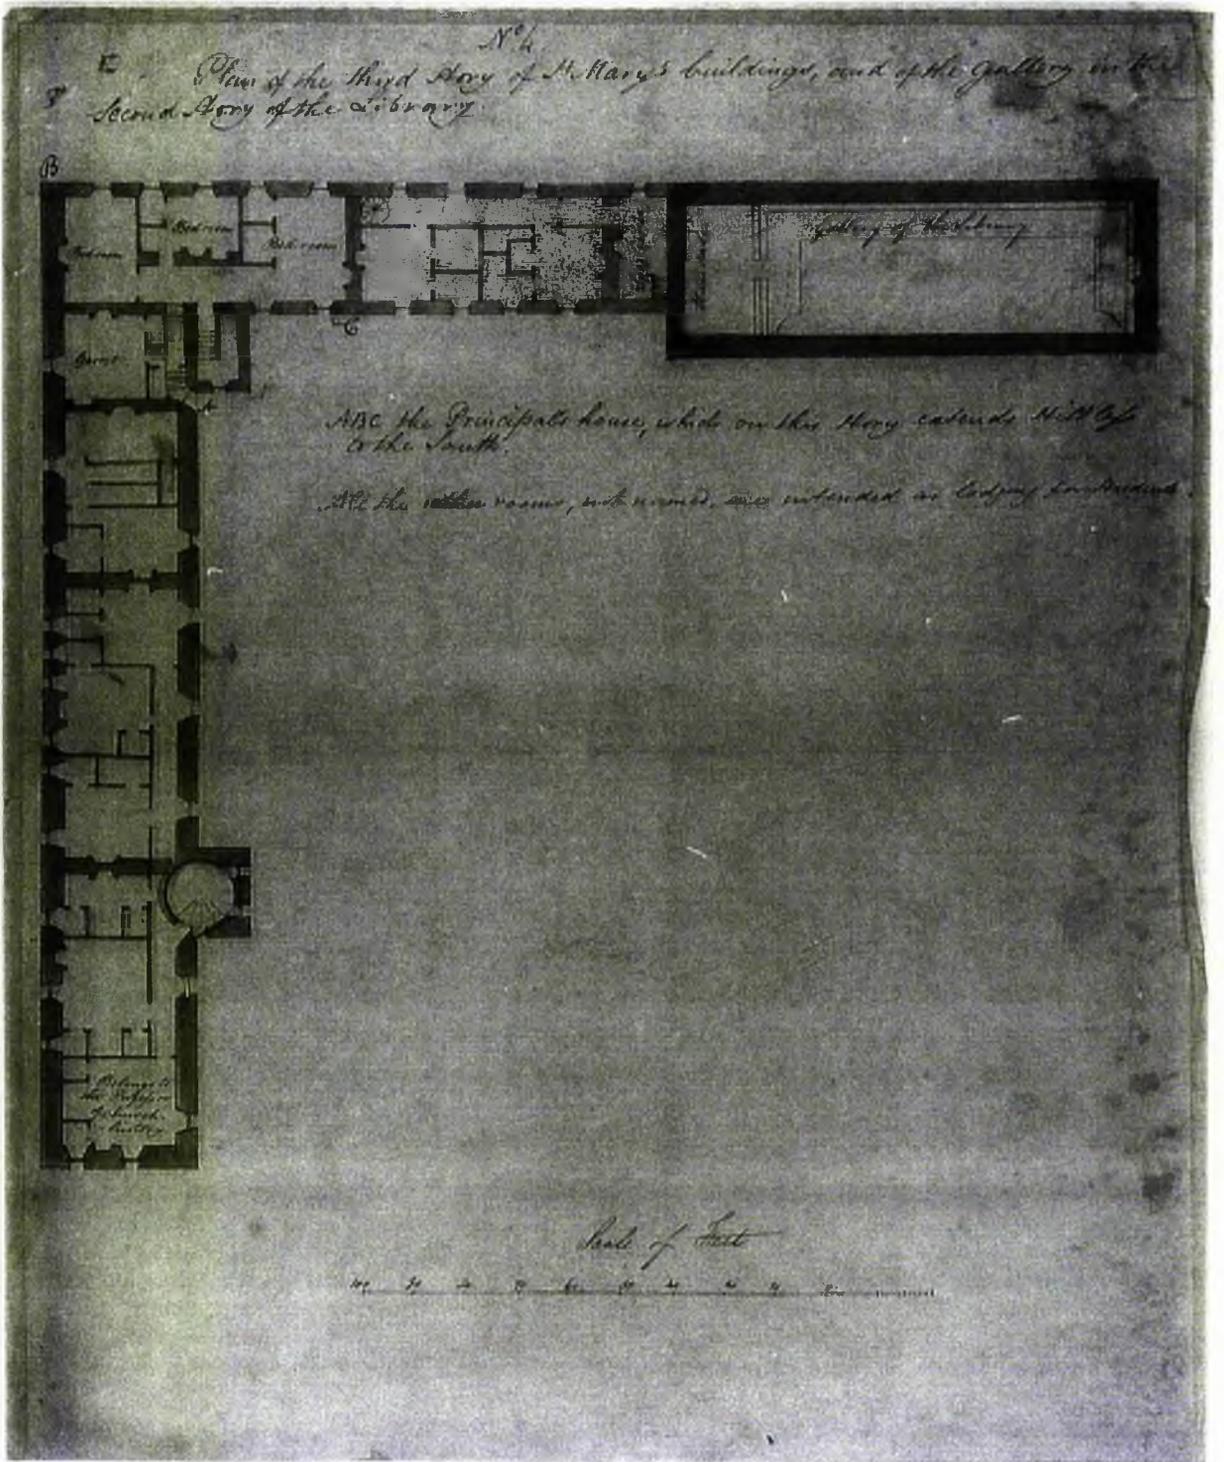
St.Mary's College. Second floor plan survey drawing No.4. R. Reid, probably drawn in 1825.
